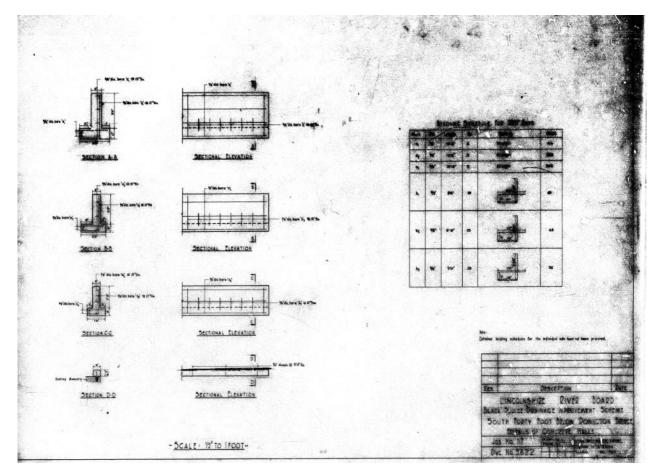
Historic design drawings for walls installed on the South Forty Foot Drain in the 1960s
